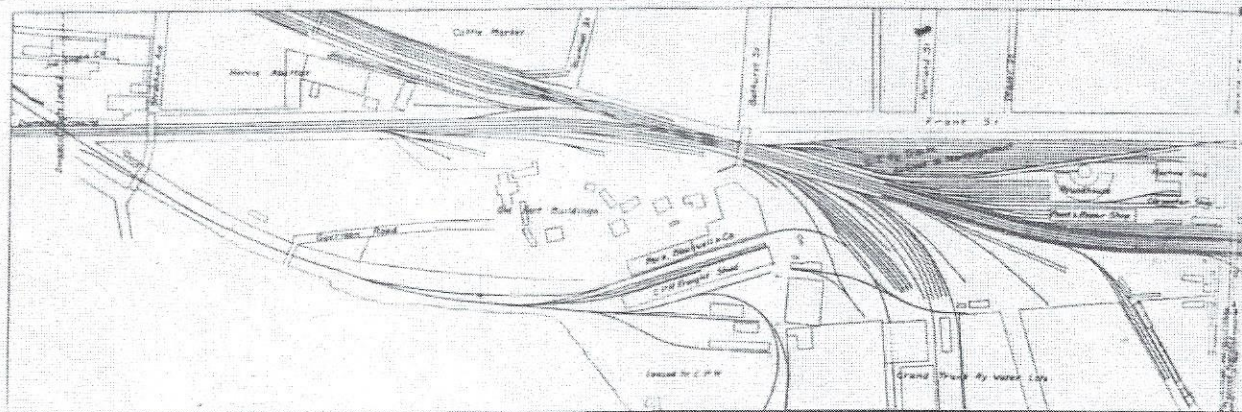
Sec. 1. Plan of Viaduct Scheme from C.P.R. Diamond Crossing to Spadina Ave.
